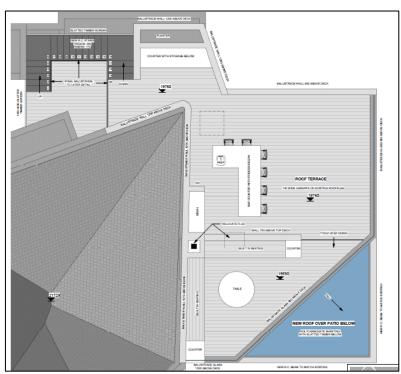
PROPOSED TERRACE ON THE ROOF OF THE SECOND FLOOR.
